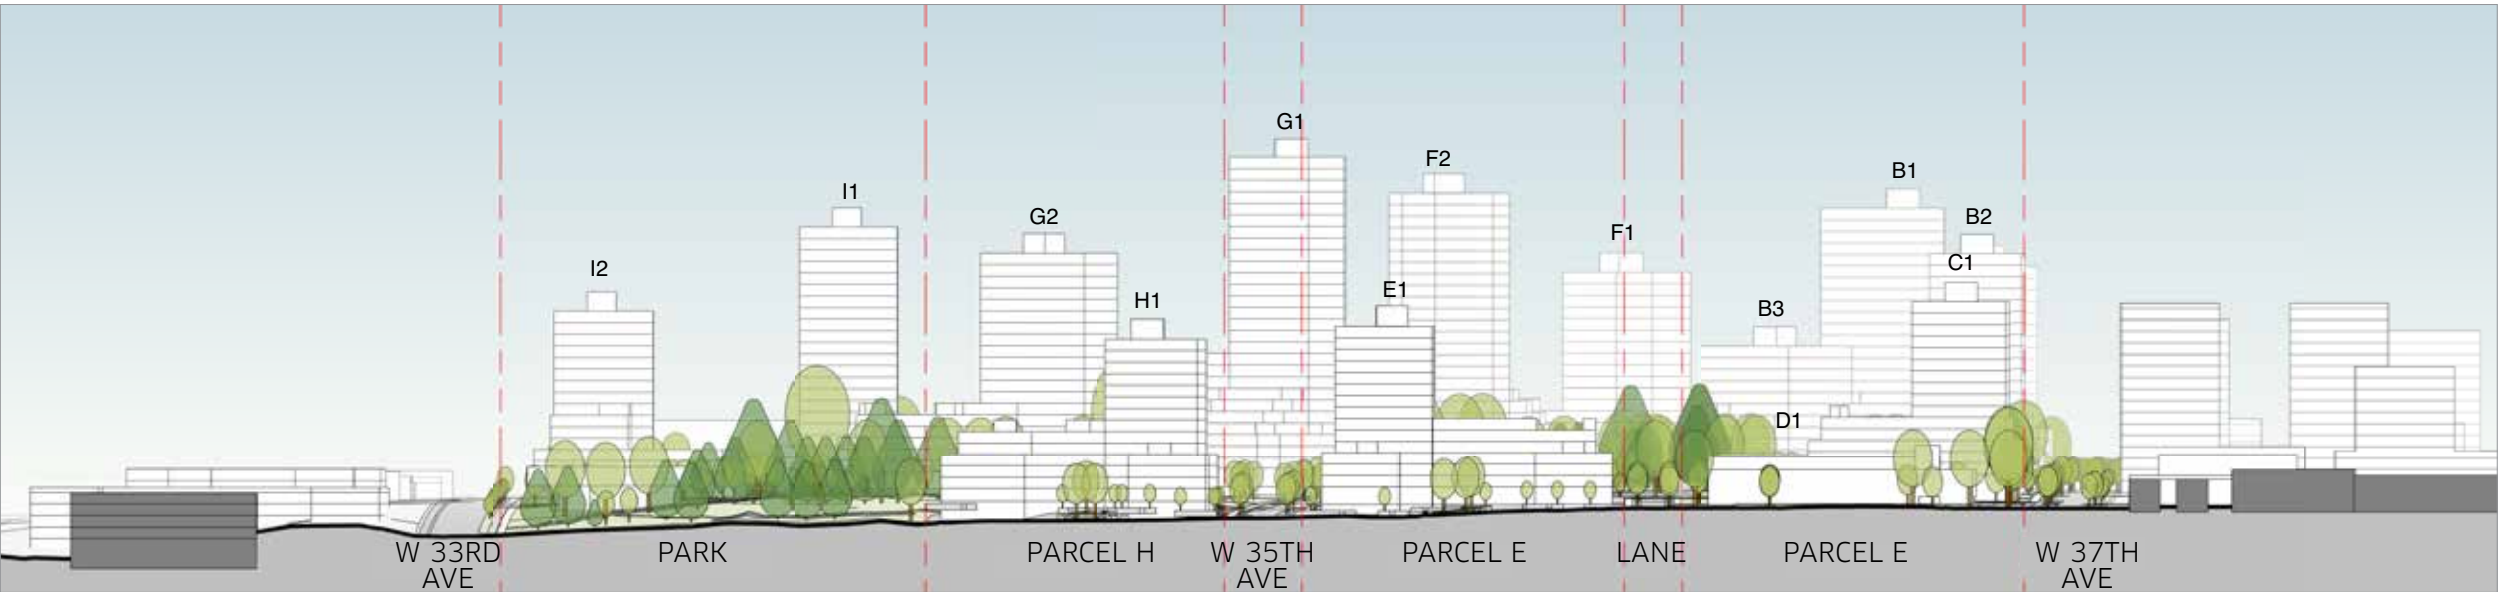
Lane West of Baillie Street, Looking East Elevation A-A
